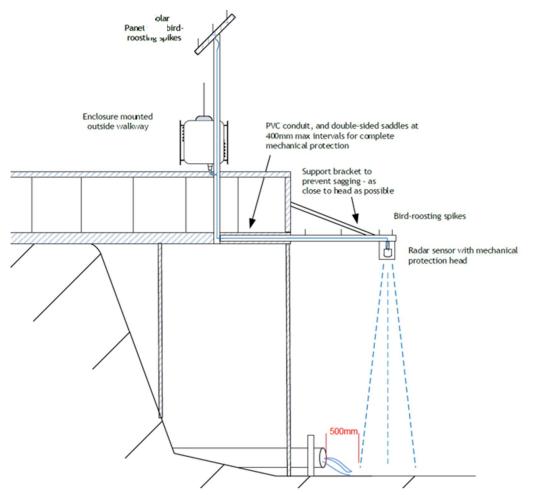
Installation type 1storage meter - elevated platform with a radar sensor for storage metering.
